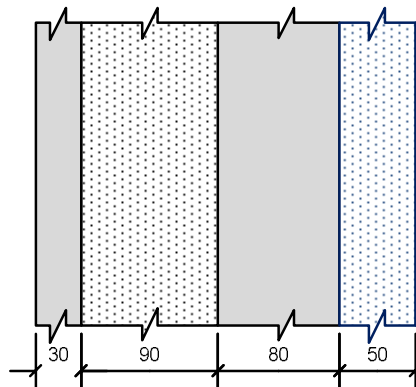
Retrofit insulation on inner surface of a concrete sandwich wall.
